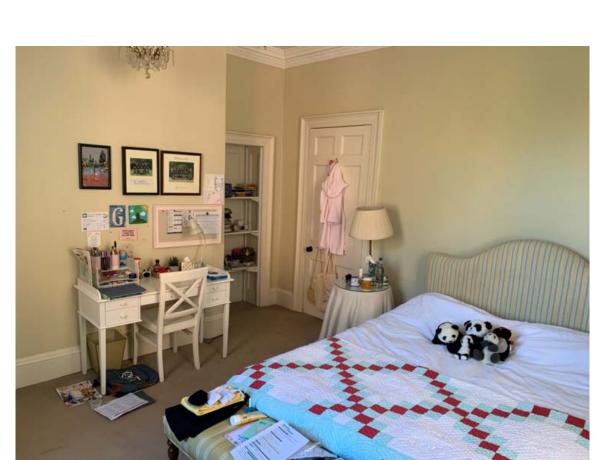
Existing Bedroom 106 Existing door on right-side of chimney breast to be returned to service. Room to be re-purposed as dressing room
